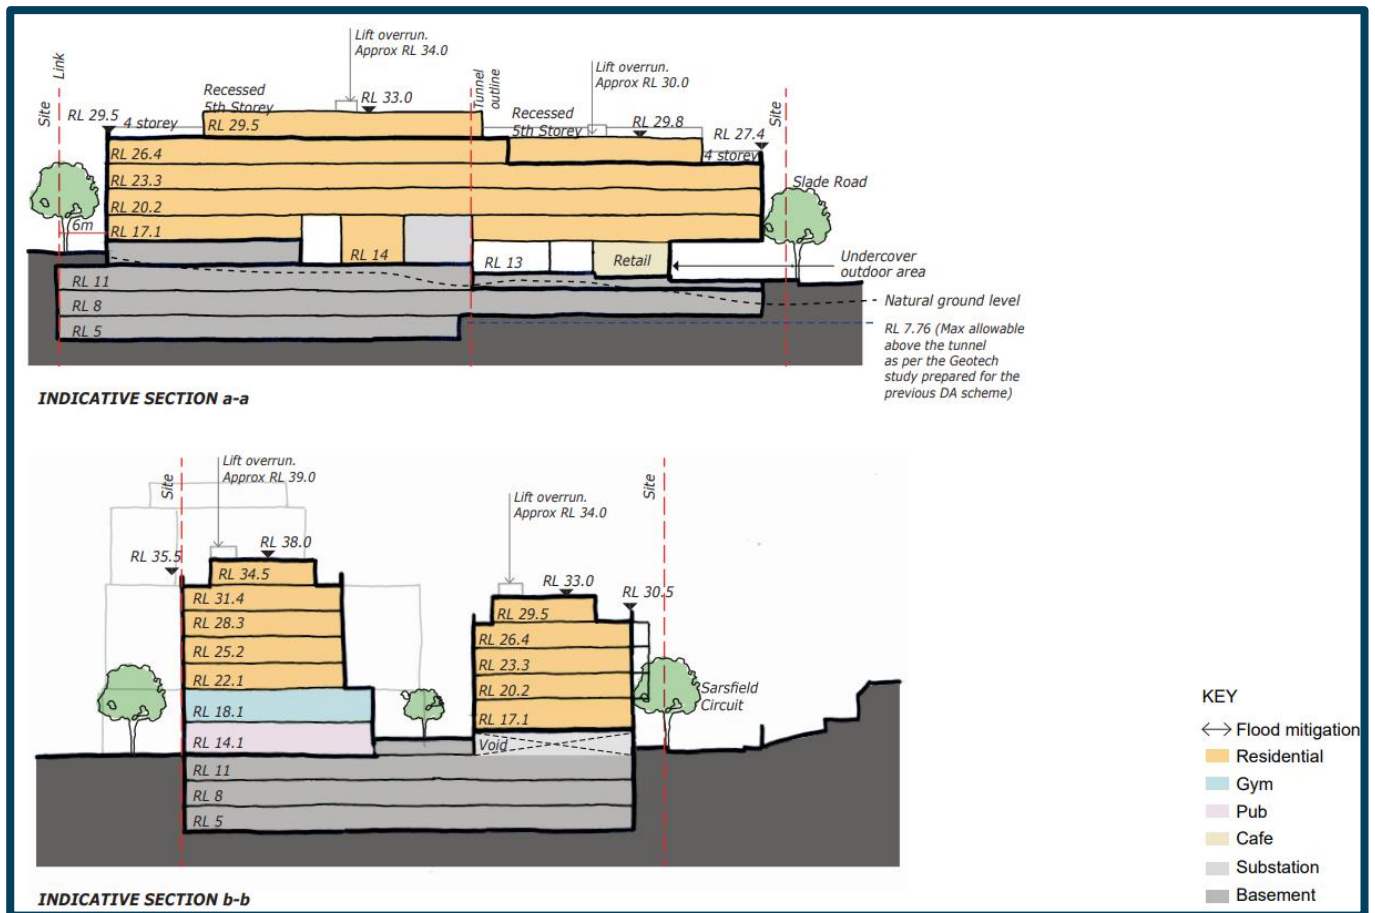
Cross sections of the concept scheme (Source: The planning proposal's Urban Design Report)
